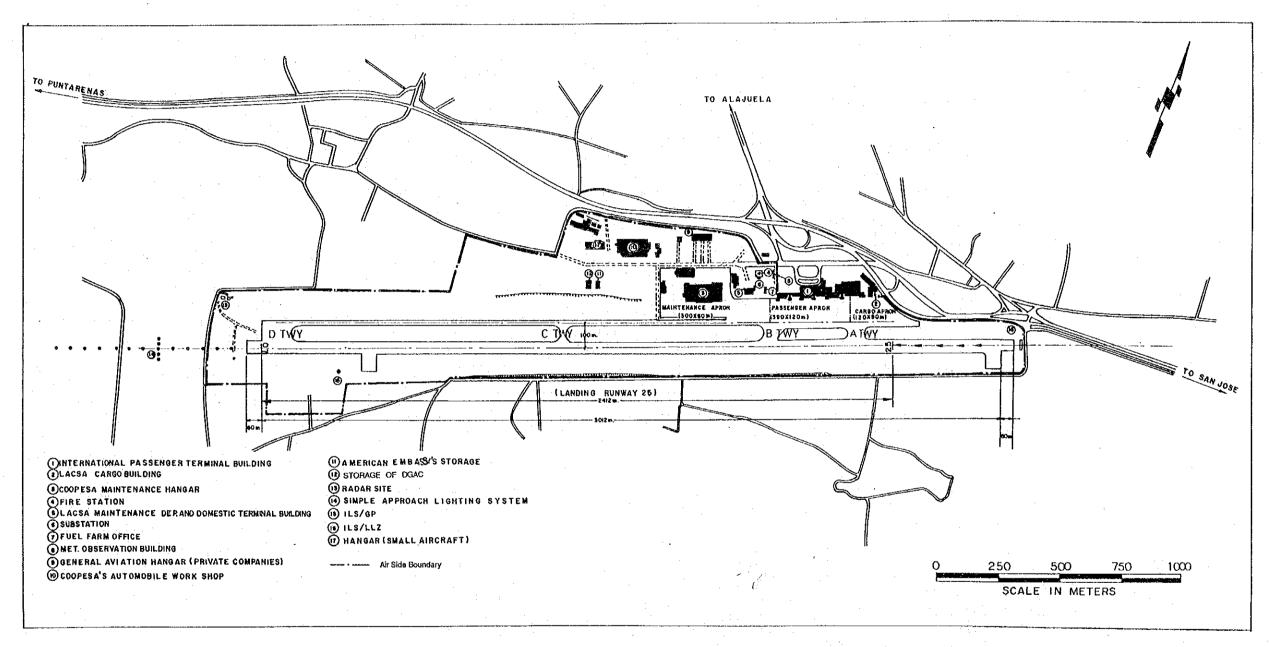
Layout Plan of Existing Juan Santamaria International Airport
